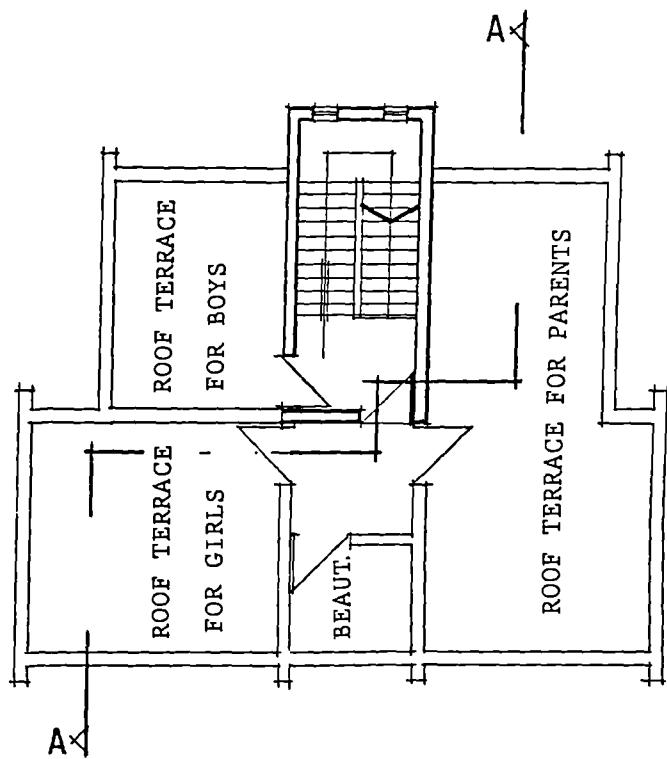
f): ROOF TERRACE PLAN (after modulation).
